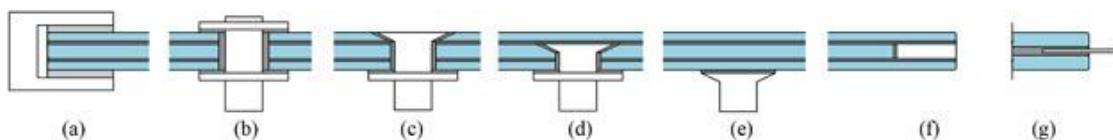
a) Clamped; b) bolted; c) bolted with countersunk bolt; d) hybrid with countersunk bolt; e) adhesive; f) embedded with thick insert; g) embedded with thin insert (Bedon & Santarsiero, 2018)
